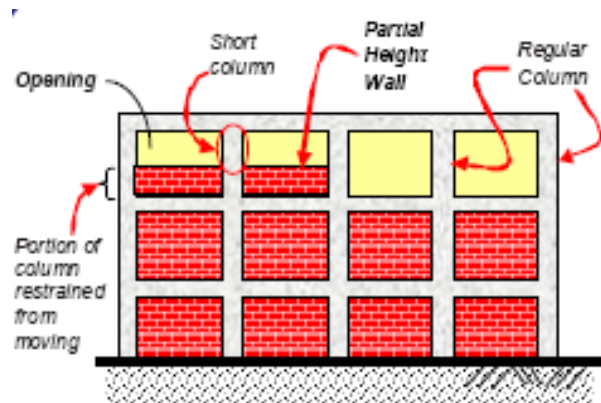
Short columns effect in RC buildings when partial height walls adjoin columns – the effect is implicit here because infill walls are often treated as non-structural elements.
